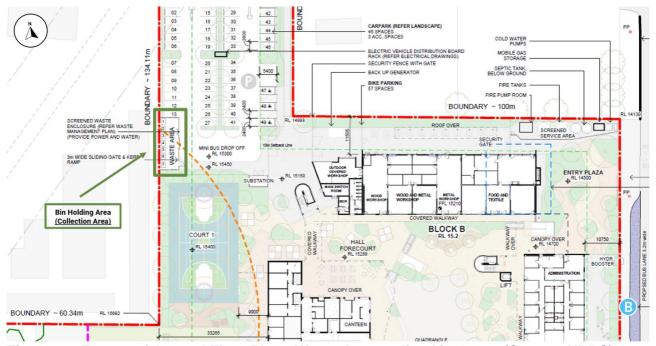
Extract of Ground Floor Plan - Waste Area outlined in Green (Source: NBRS)
